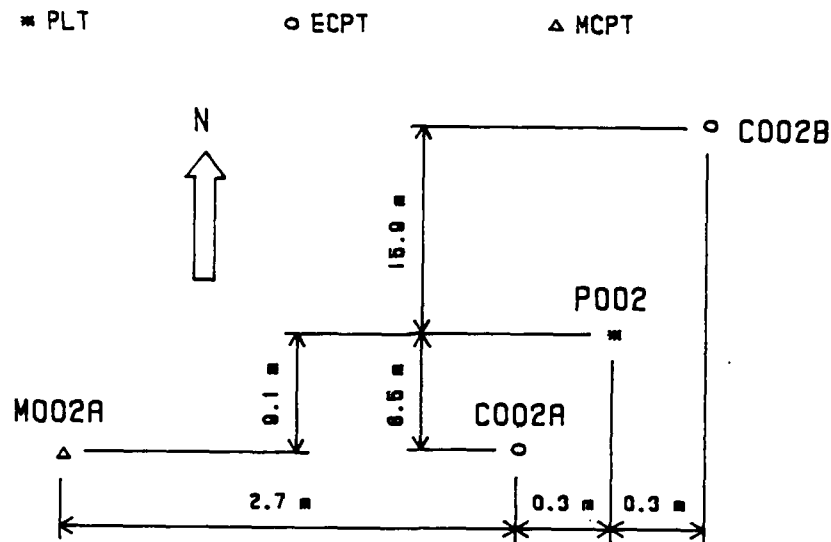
Apalachicola River Bridge Flat Slab Bent 16 Tests
